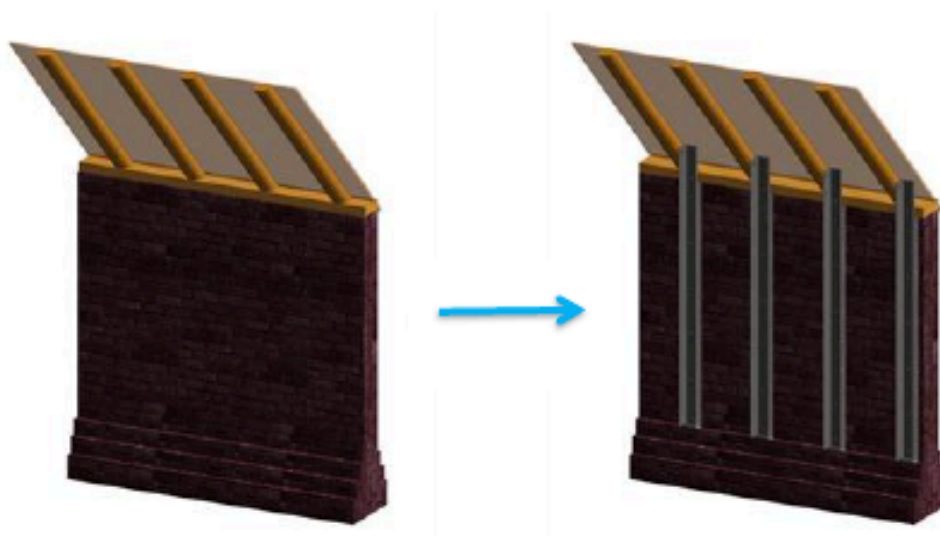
Addition of structural elements to increase in-plane and/or out-of-plane strength of wall piers.
